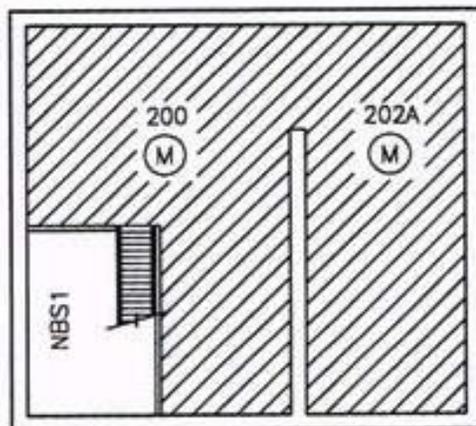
Building 827C - Mezzanine, Facility Keyplan, 1996. LLNL Archives, (PKS96-827C-002BA)
